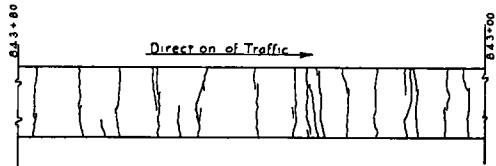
Crack Pattern—8-in. Section—Outside Lane—Nov. 1950.
